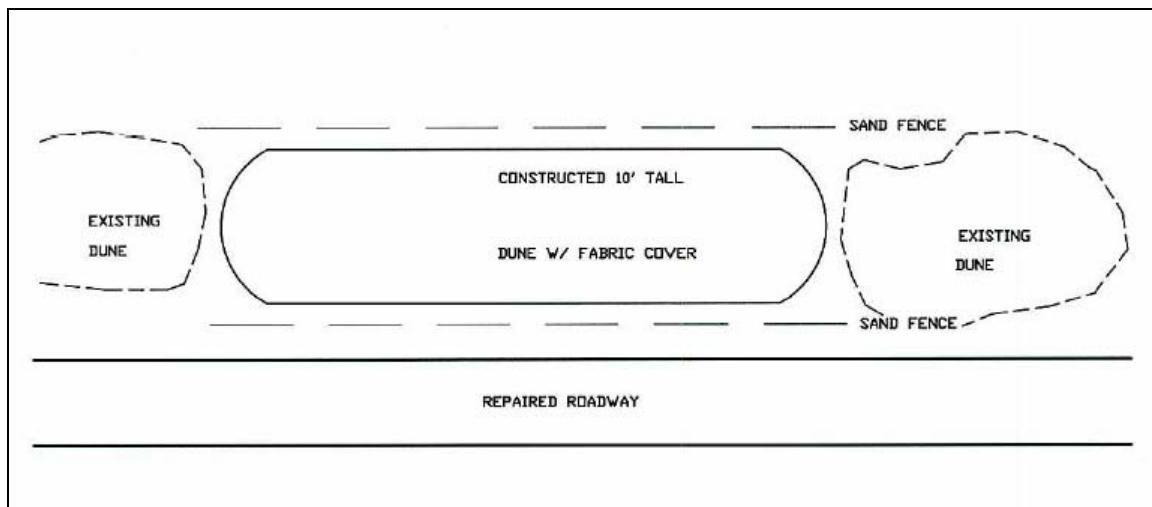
Base Concept for Proposed Dune Reconstruction
